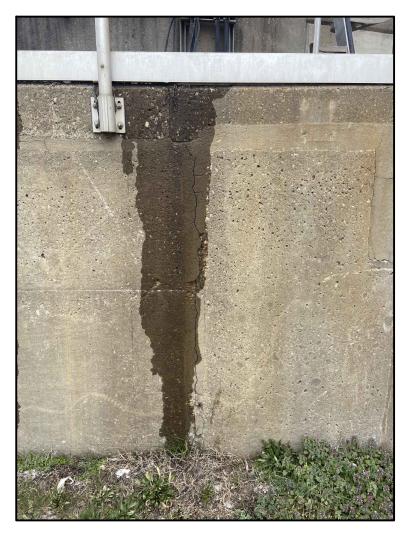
PHOTO - CRACK AT GST BUILDING <u>4</u> EXTERIOR PLATFORM S-100-02 SCALE: NTS
